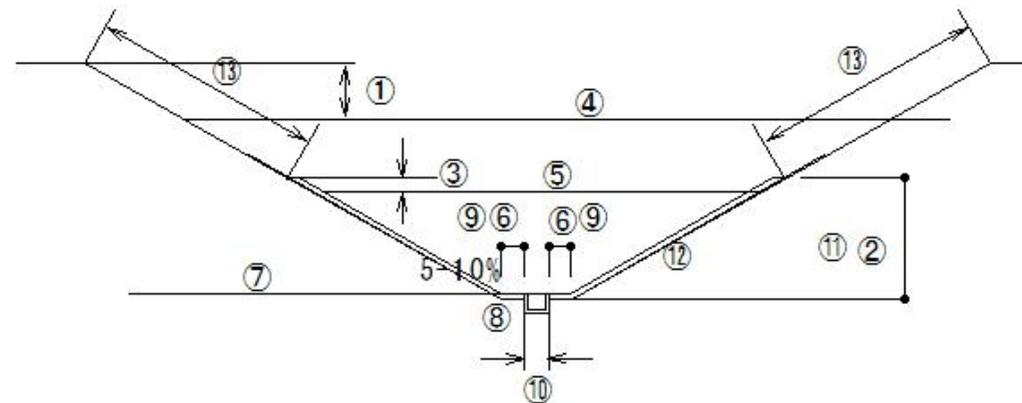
shows an example of the layout of the guide bottom channel, lining, and slope protection works.
